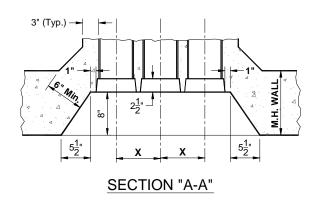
FIGURE E – PROFILE & SECTION VIEWS STANDARD UNREINFORCED CONCRETE DUCTBANK CONSTRUCTION DETAILS
